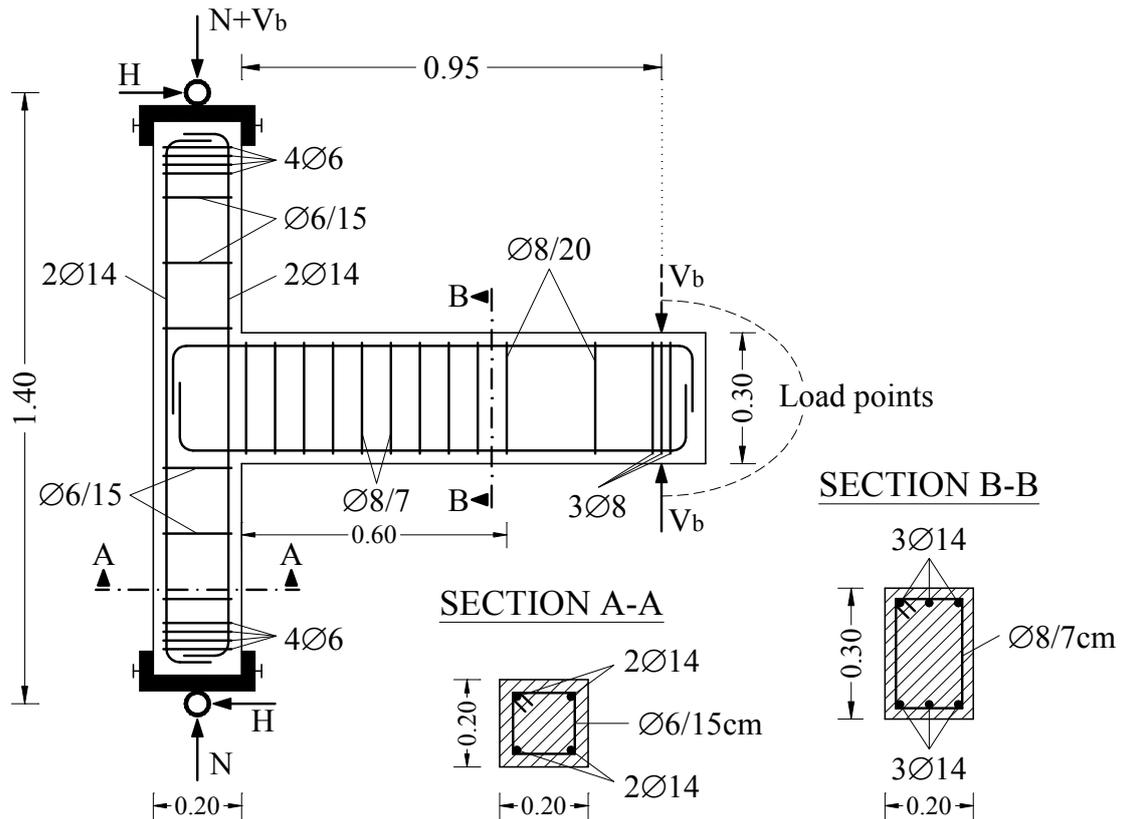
Dimensions and cross-sectional details of original subassemblages O_3 , W_2 , W_3 , M_1 , and M_3
